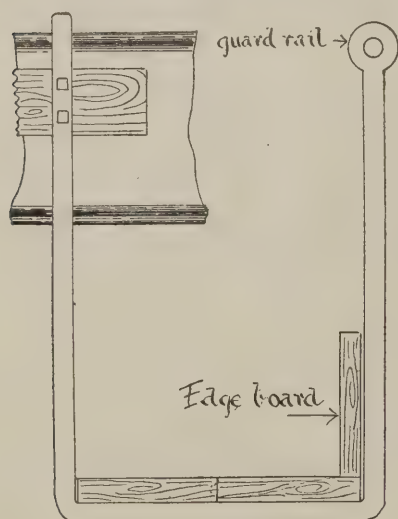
Sectional View of Platform When Arranged as Indicated in Fig. 8.
